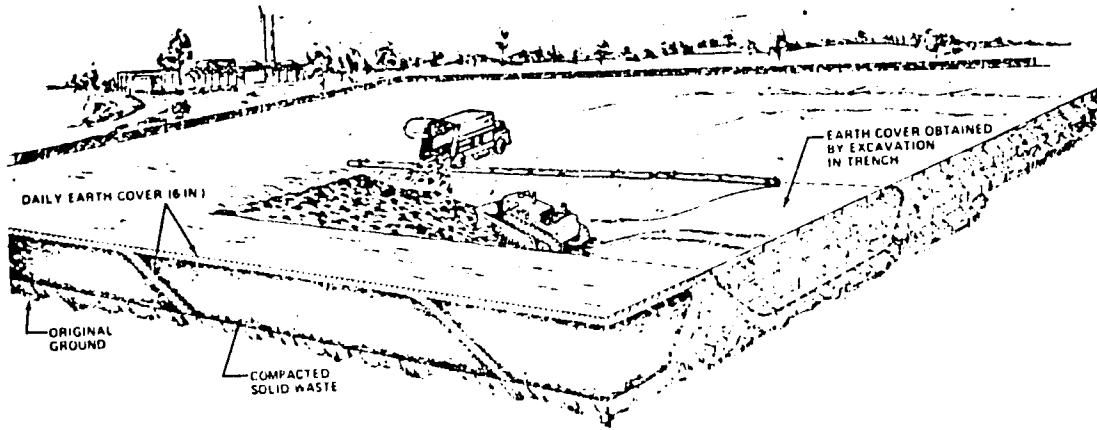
In the trench method of sanitary landfilling, the collection truck deposits its load into a trench where a bulldozer spreads and compacts it. At the end of the day, the trench is extended, and the excavated soil is used as daily cover material.
